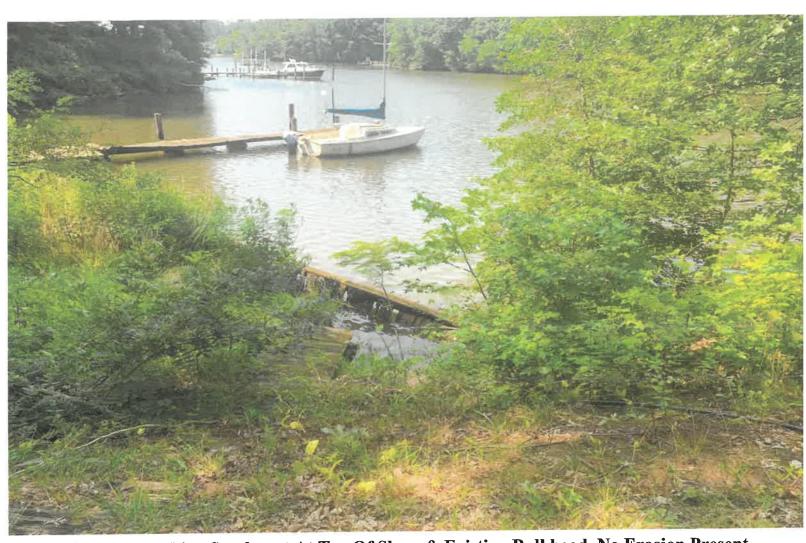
Looking Southwest At Toe Of Slope & Existing Bulkhead, No Erosion Present
